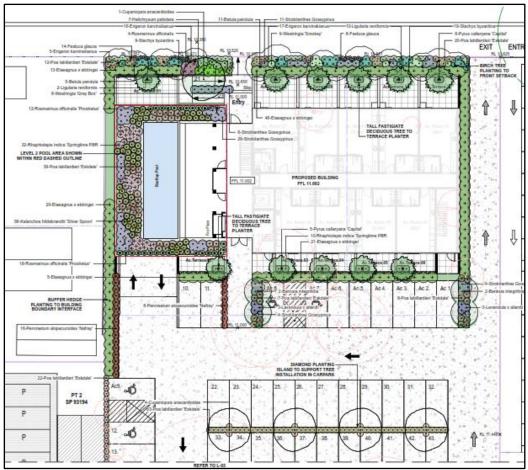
Extract from proposed Landscape Plan – hotel accommodation and car park Source: H&E Architects
